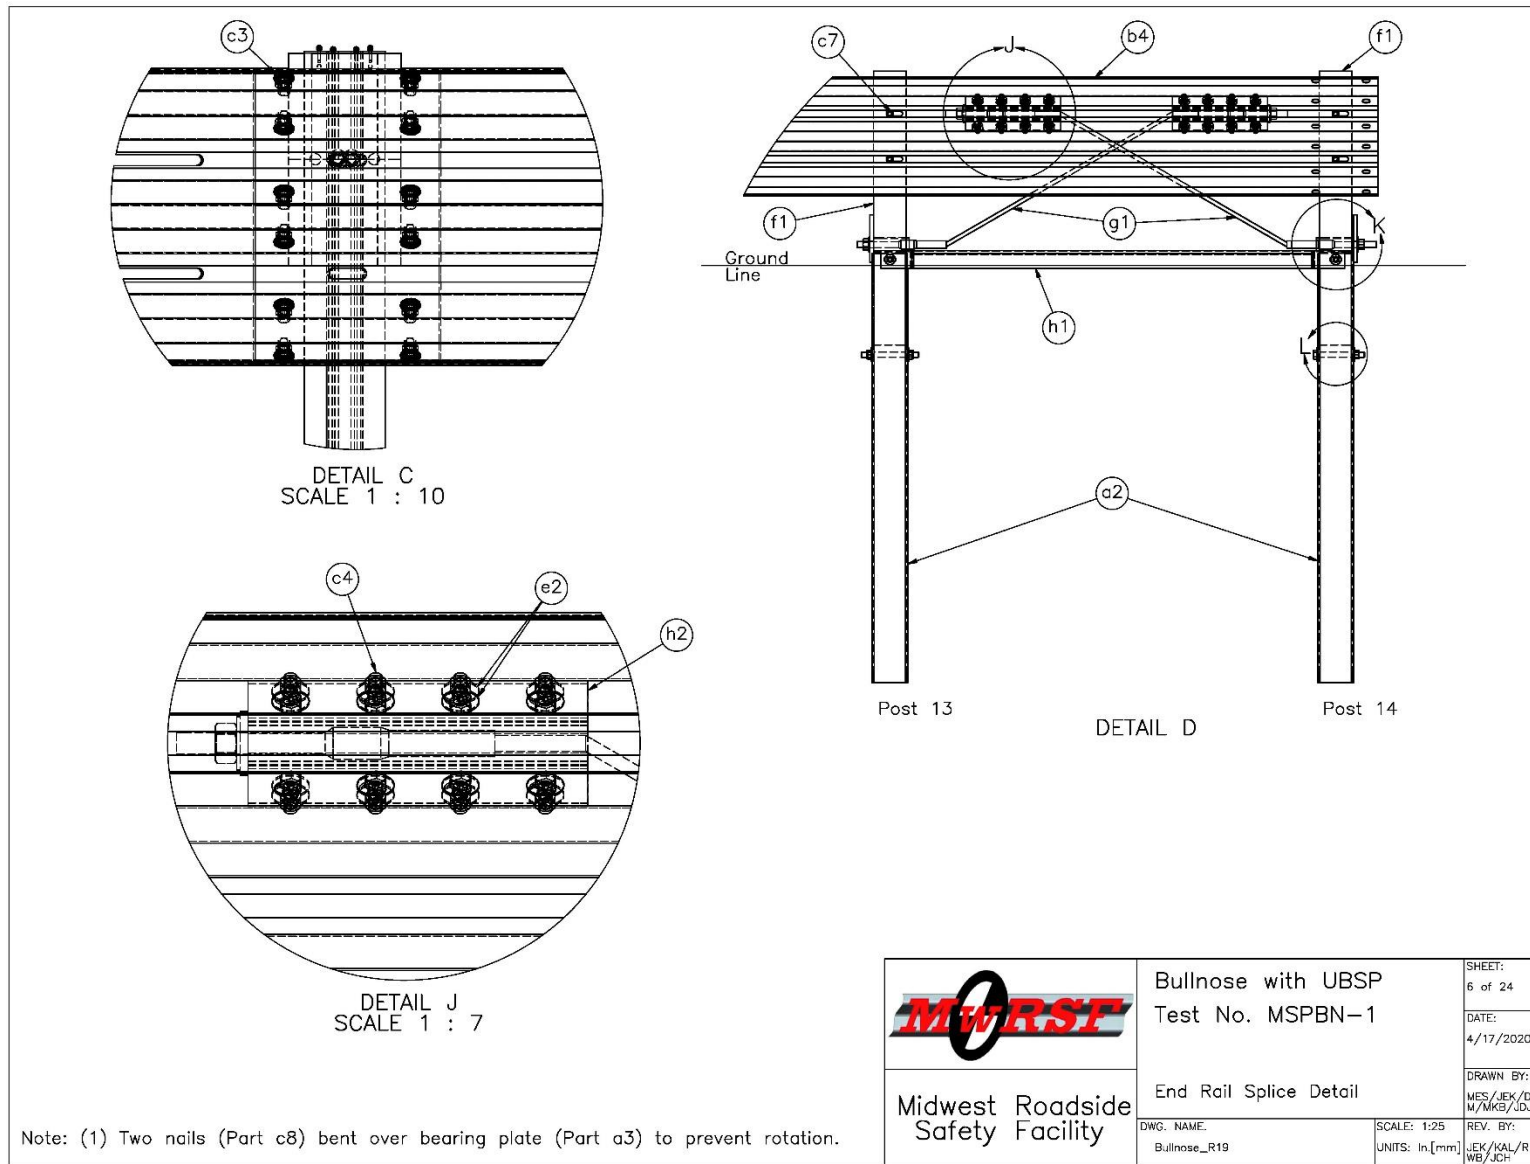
End Rail Splice Detail, Test Nos. MSPBN-1 through MSPBN-3
